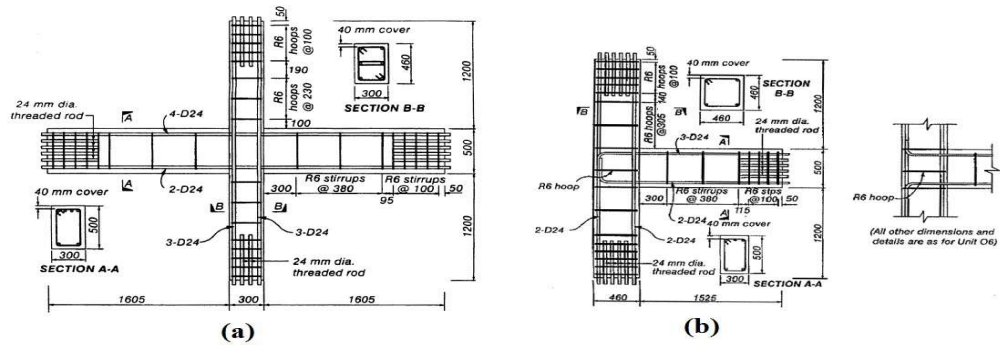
Interior and Corner BCJ Reinforcement Configuration [8]
